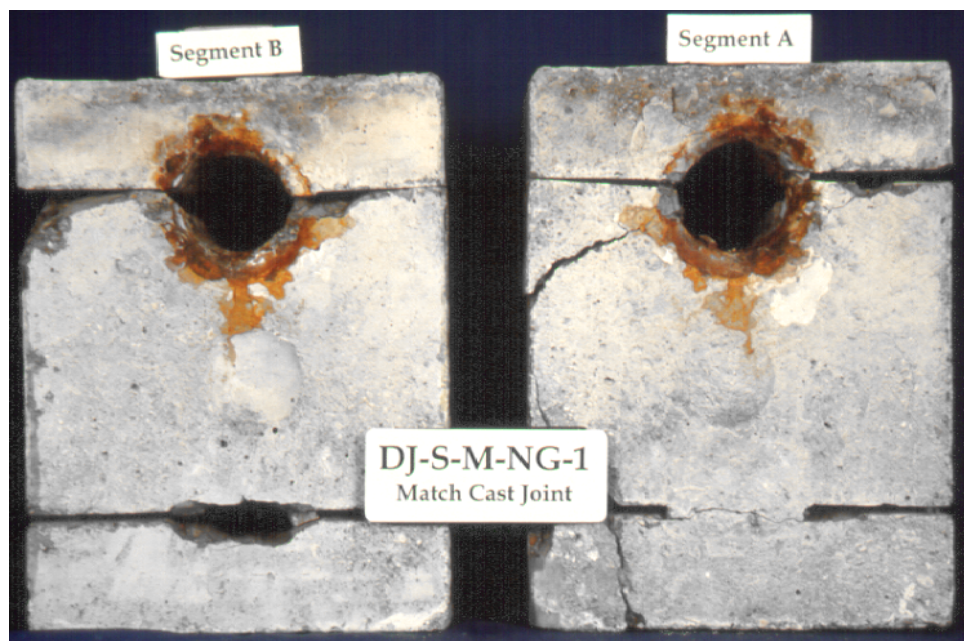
Rust Staining Around Duct Opening in Dry Joint Face
